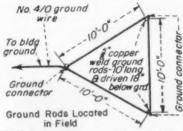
Equipment ground is made by connecting grounding wire network to ground rod arrangements at several locations outside the building. A typical arrangement of rods is shown here.
